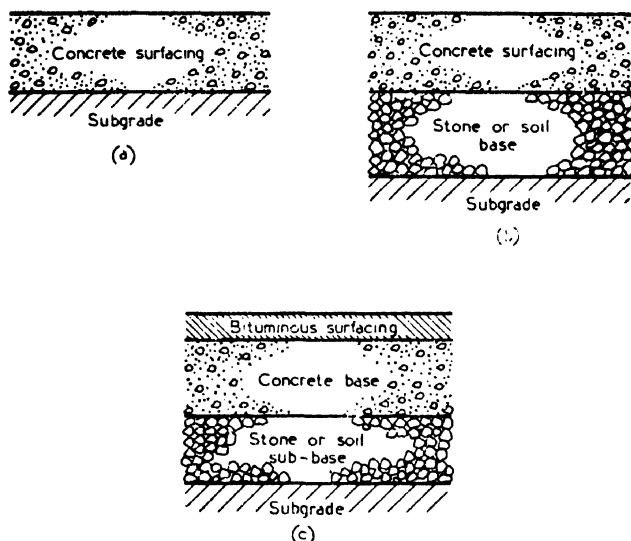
TYPICAL FORMS OF ROAD CONSTRUCTION: CONCRETE
